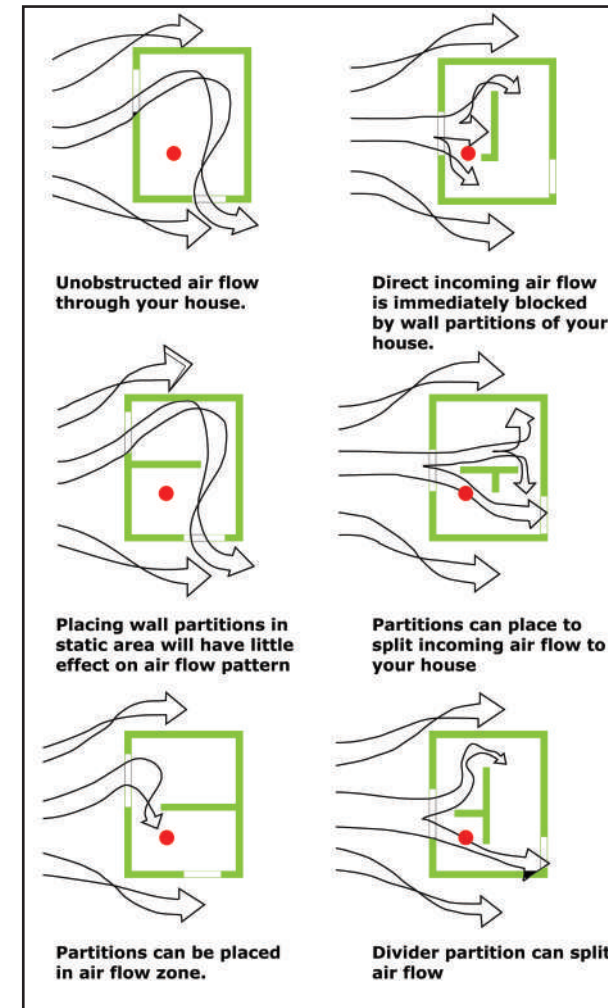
Use Open Plan Interior to Promote Air Flow.
